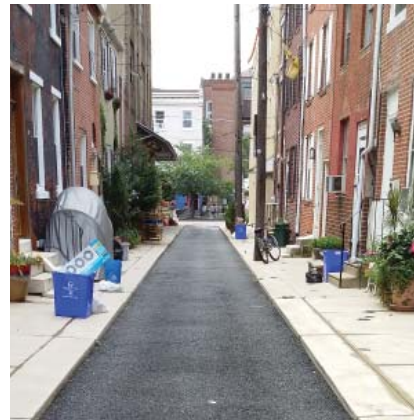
Examples of Pervious Pavement in Philadelphia
